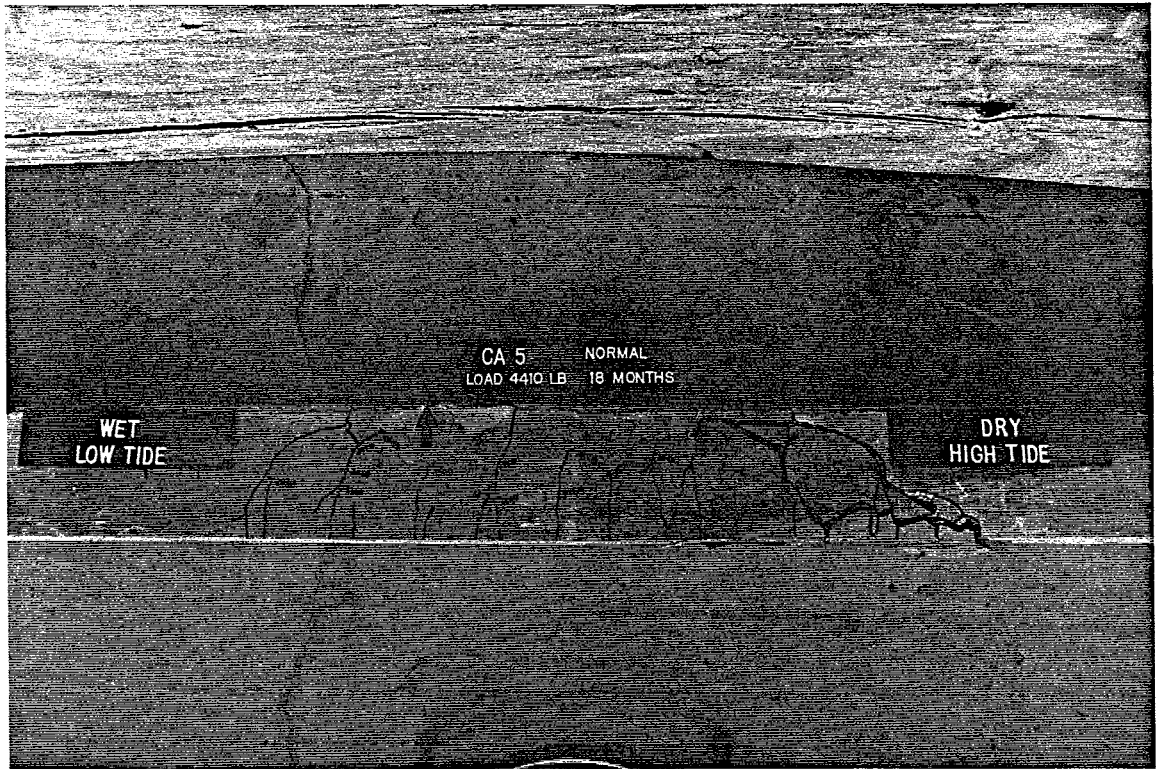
Crack Pattern for Beam CA 5 - Tested After 18 Months
